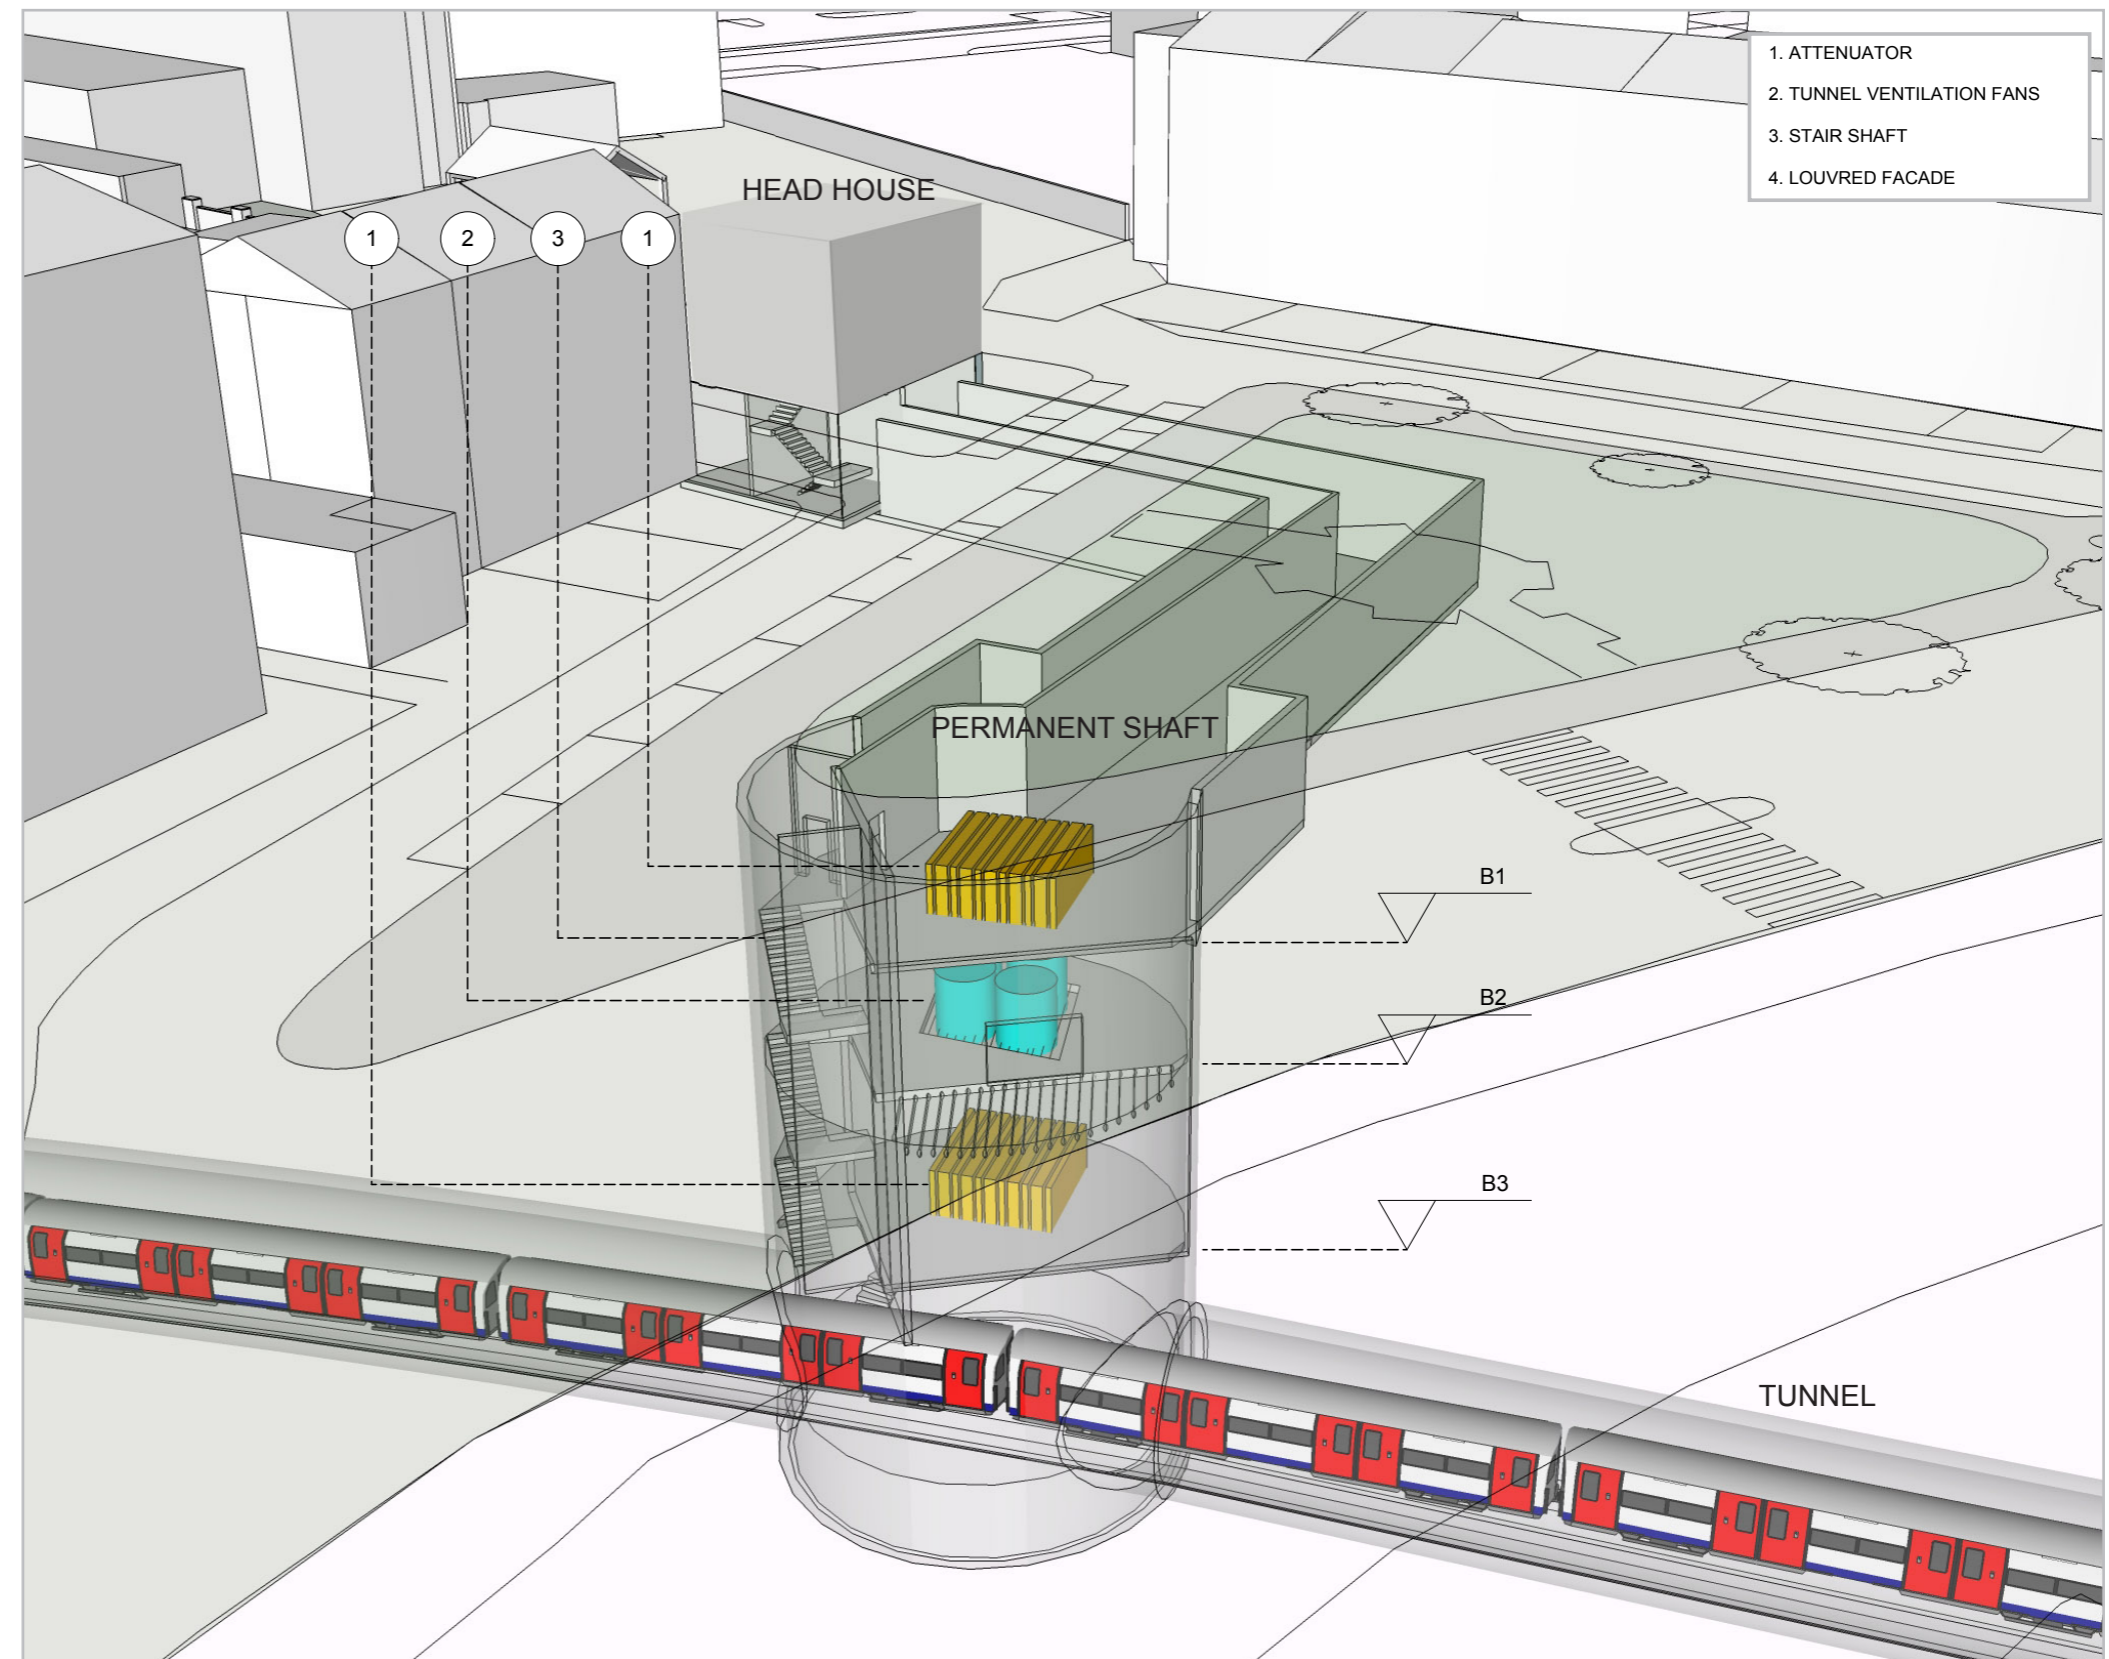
Kennington Green - Proposed Layouts of the Head House
